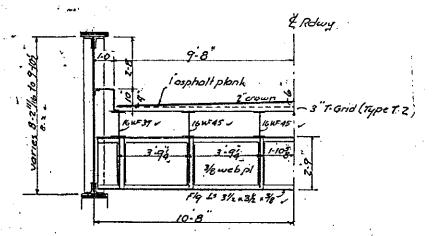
EXHIBIT VI New Hampshire Bridge Inventory Card Index
